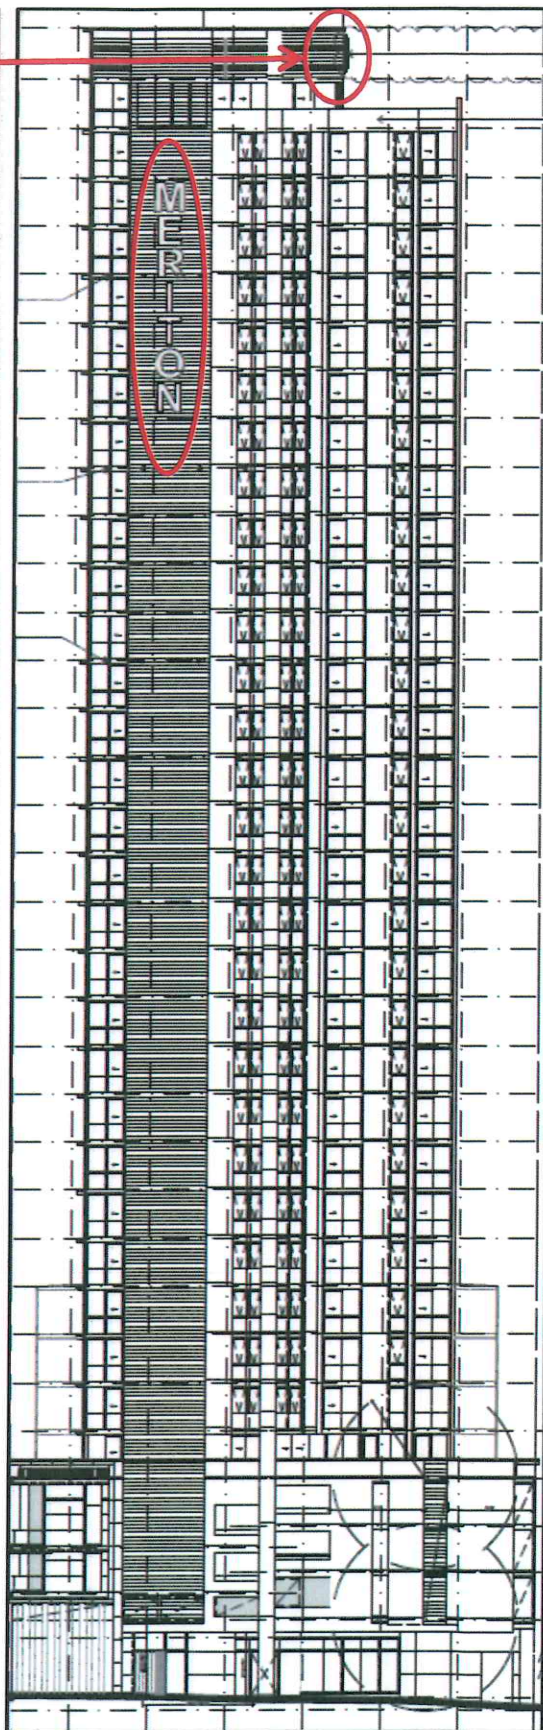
Proposed Sign 2 on western elevation between Level 26 and 30
